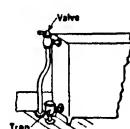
TOP AND BOTTOM RADIATOR CONNECTIONS
